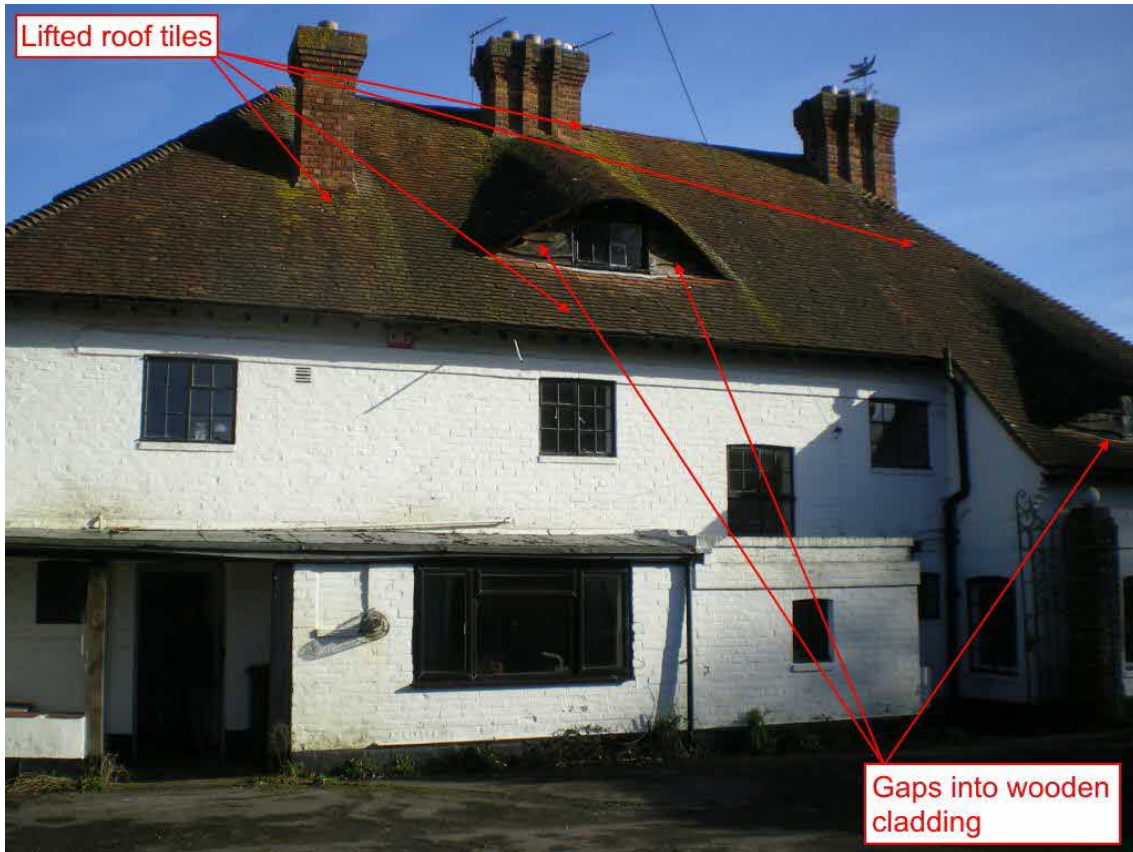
Location of potential bat access points and potential exterior roof features on the west elevation of the house.
